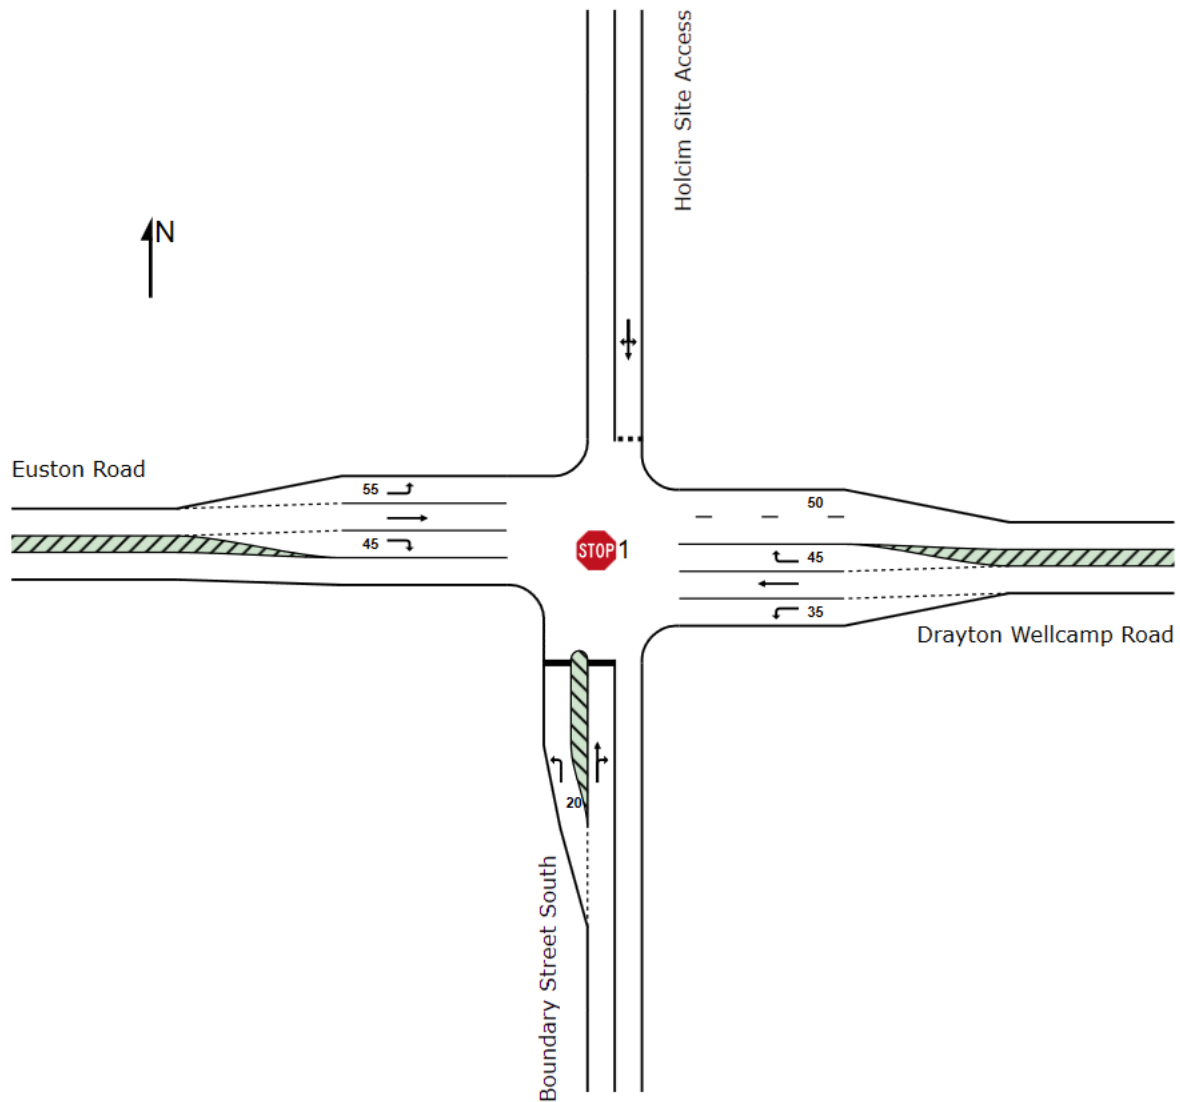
Drayton Wellcamp Road / Boundary Street South / Holcim Site Access
